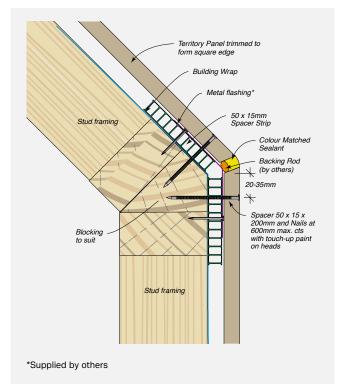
Obtuse Angle Corner Detail – With Metal Flashing and Colour Matched Sealant - Plan View
